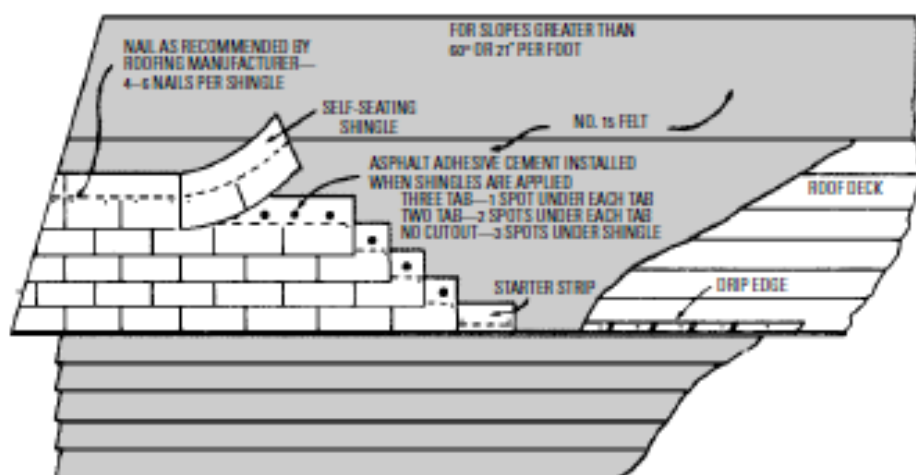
If the roof slope exceeds 60 degrees, you have to take special steps in application.
